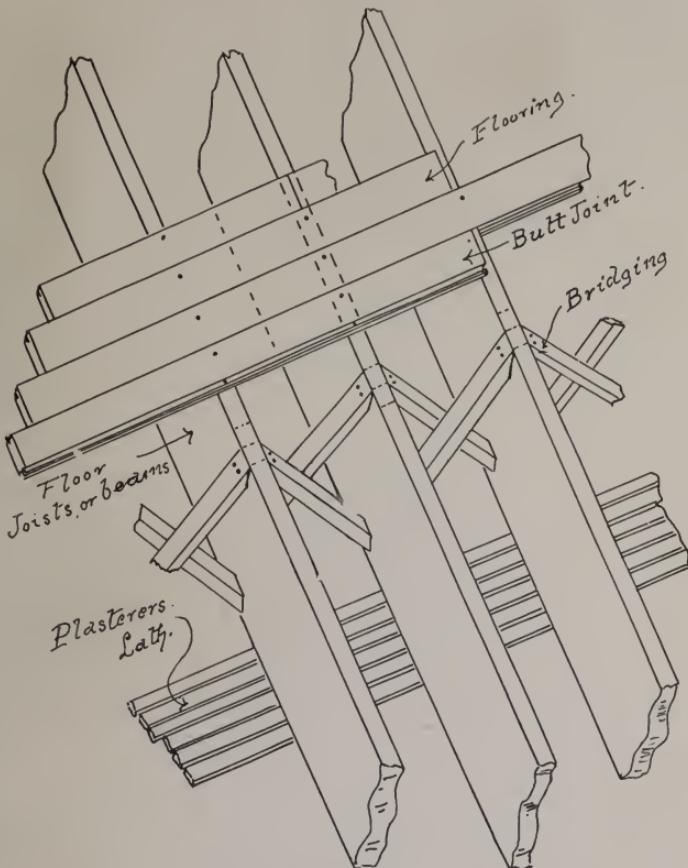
PROJECTION OF A BALLOON FRAME FLOOR.
